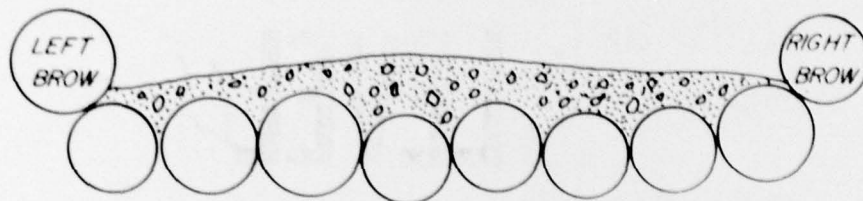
Cross section of a typical log stringer bridge. Bridge shown consists of 10 logs (8 stringer and 2 brow logs).
